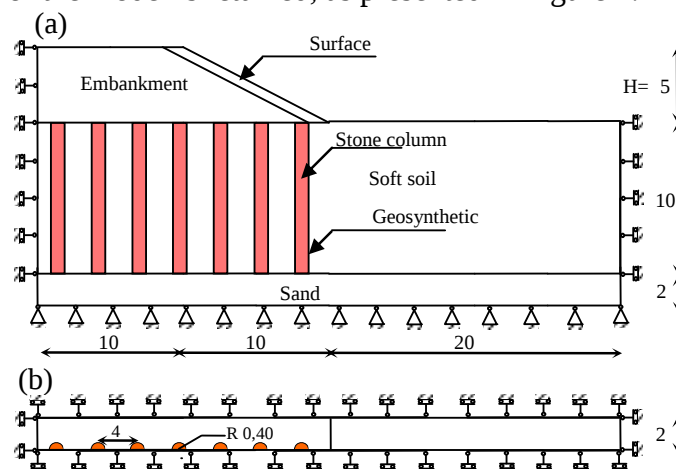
3-D finite-element model: (a) cross section; (b) plan view (unit: m).
